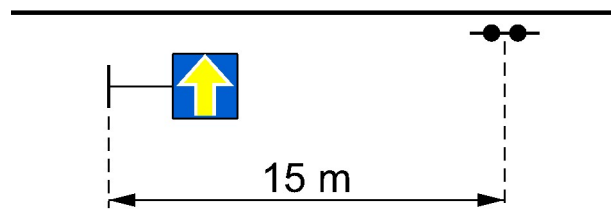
AXLE COUNTER AT A MARKER BOARD LOCATION
